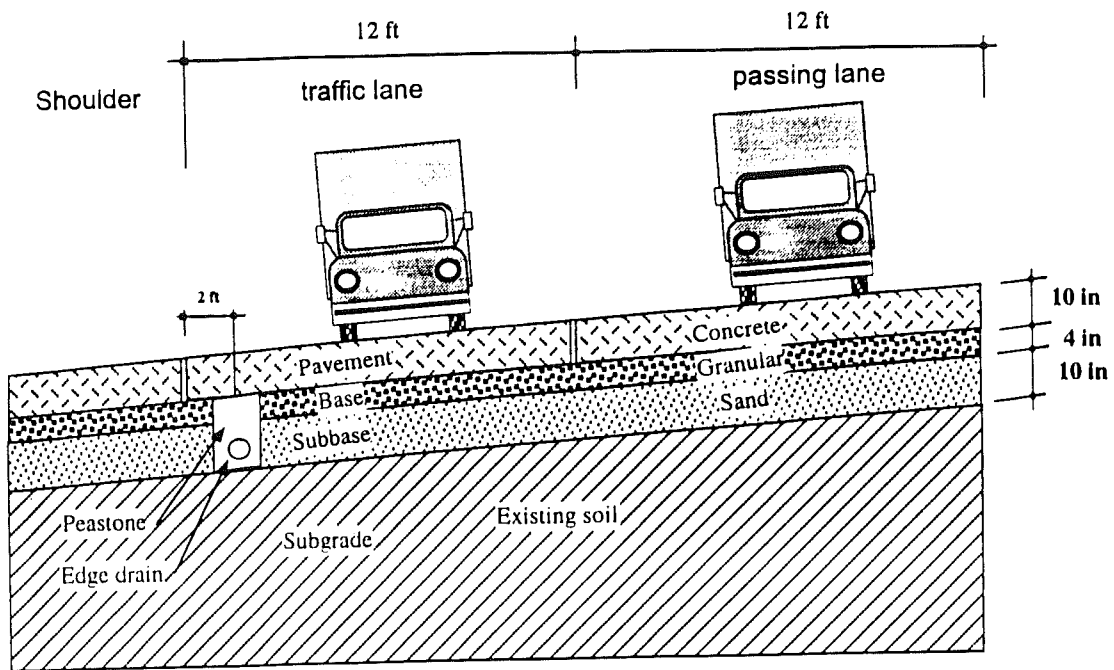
Typical view of pavement system cross-section for both the Lawrence and Galesburg projects.
